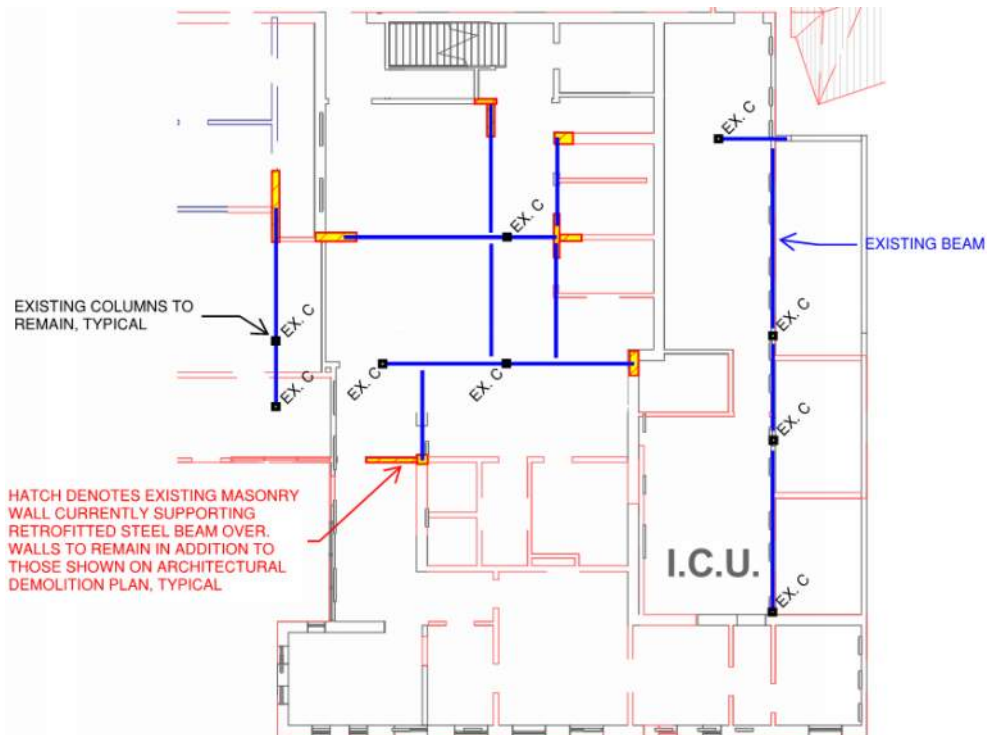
ED/ICU existing structural beam and column layout overlaid on demolition plan.
